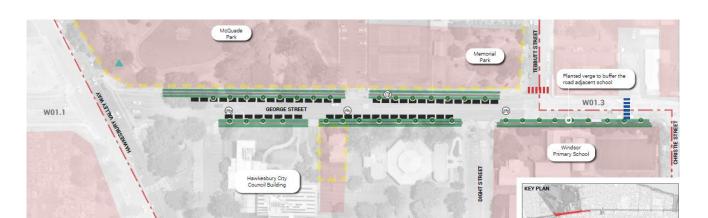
Proposed upgrades for W01.2 George Street Green Boulevard
